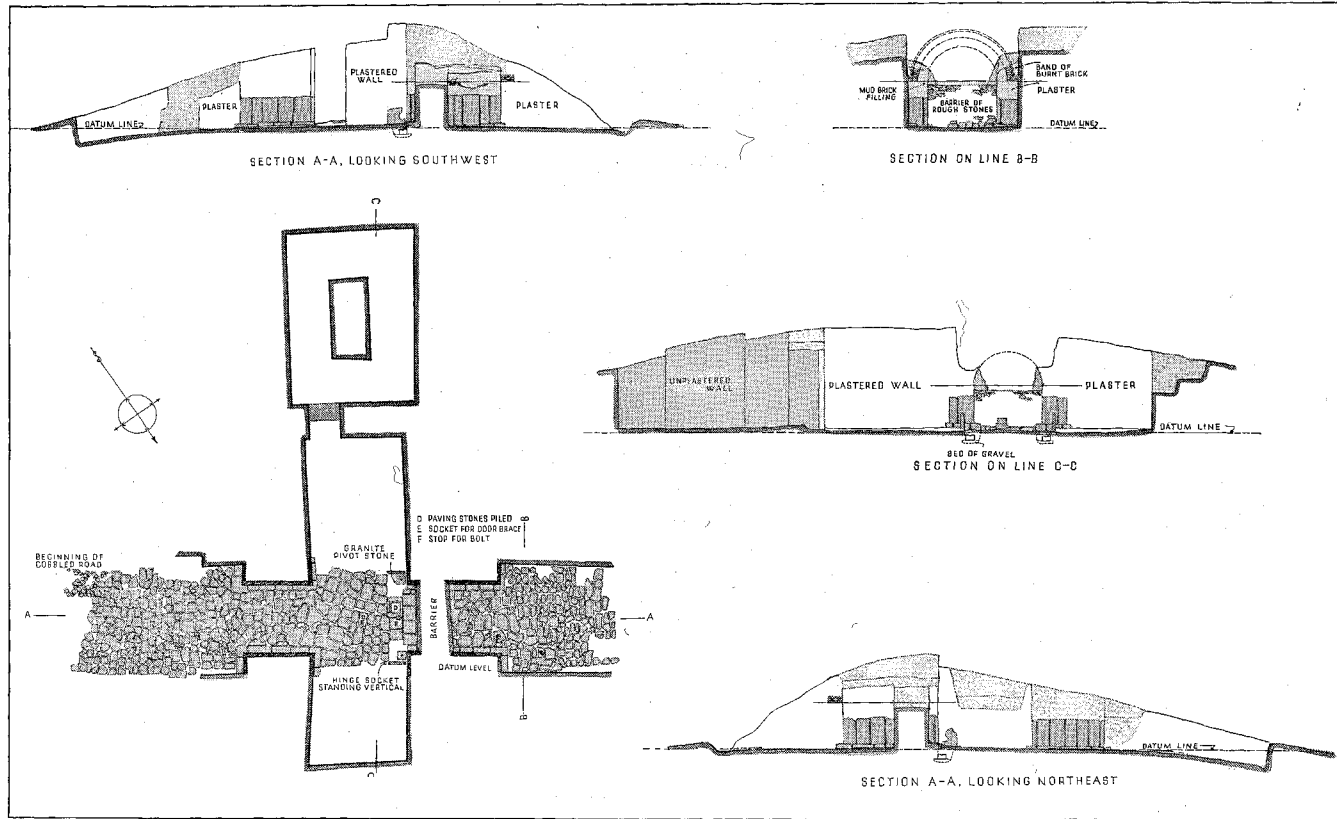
Plan and cross-sections of Gate 7. Scale, 1:500
